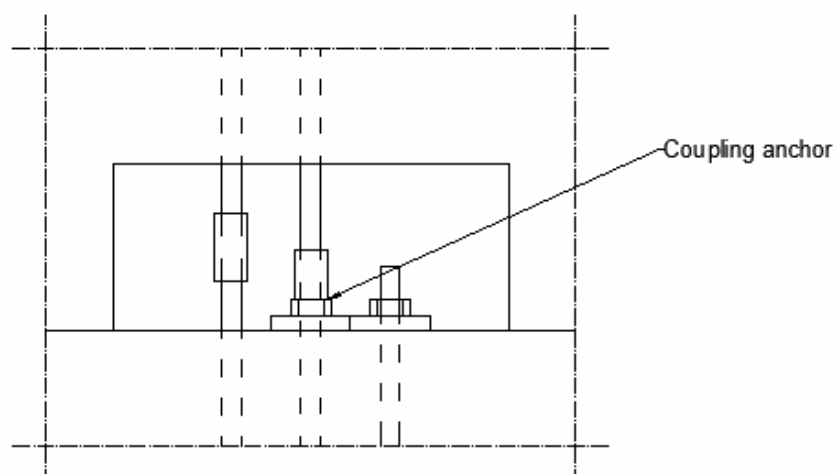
Proposed anchorage above the -1<sup>st</sup> floor core segment
